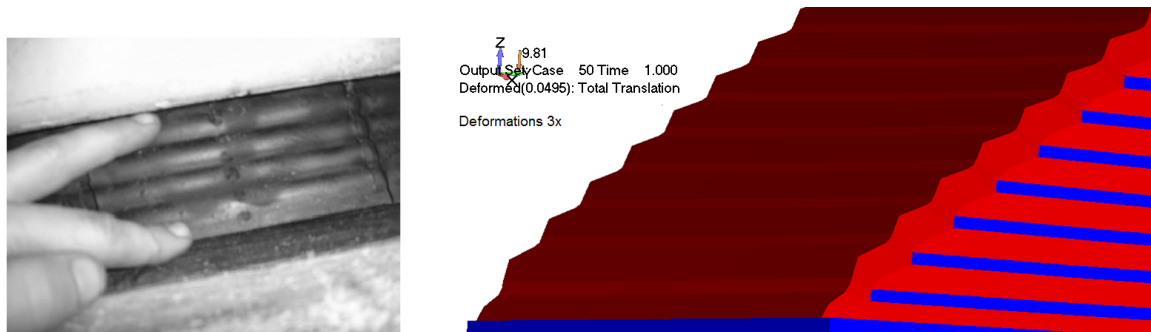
(Left) Deformed shape after tension debonding of reinforced elastomeric bearing with steel plates [63] and (Right) Deformed shape of bearing as it resulted from the Hexa20 model (50% V_u + 100% H_u).
